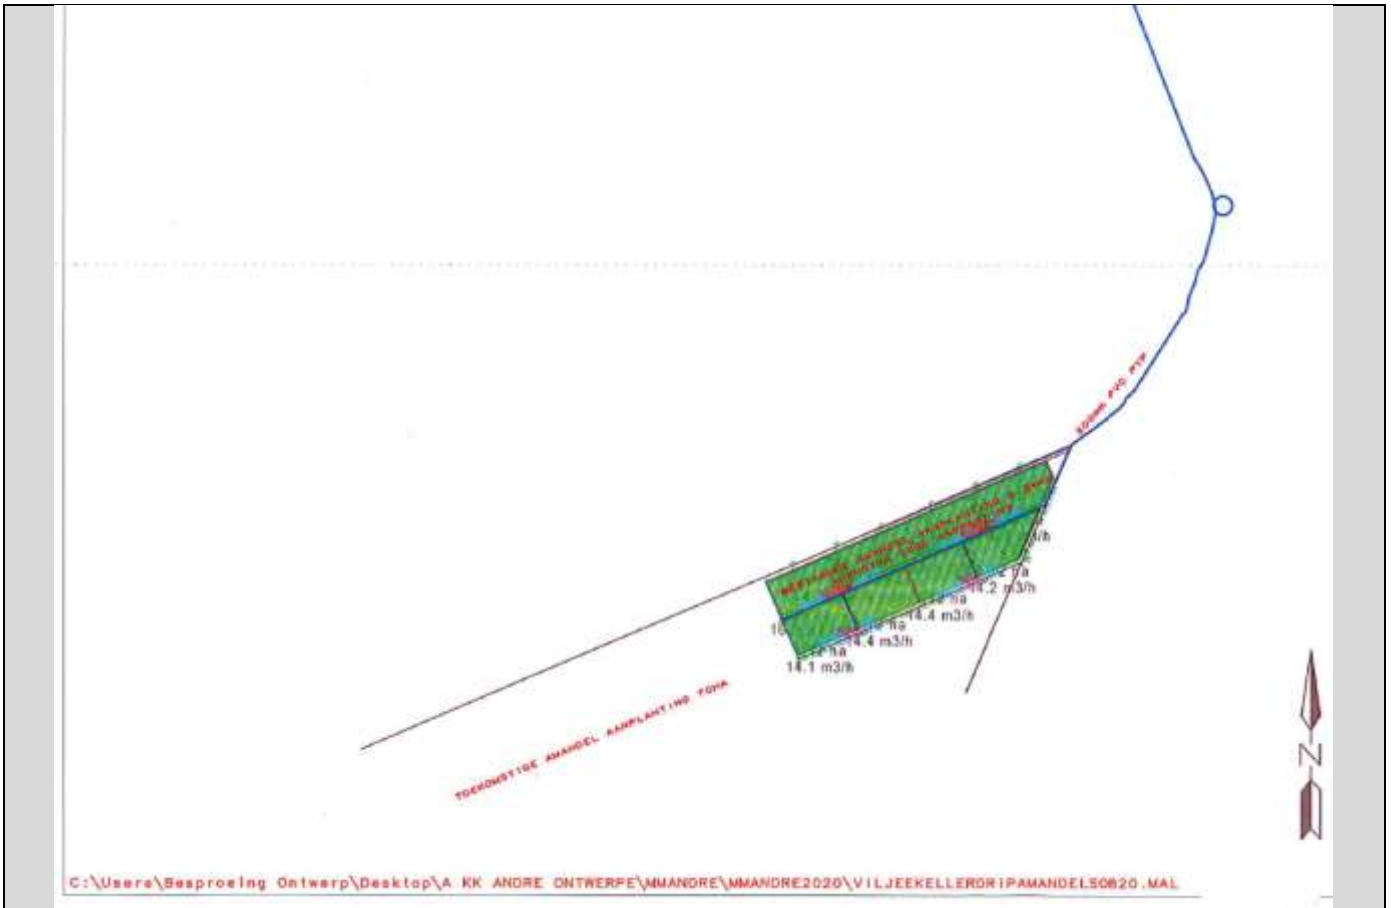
Irrigation design plan for the full extent of the project at 70ha (Source: Applicant).
